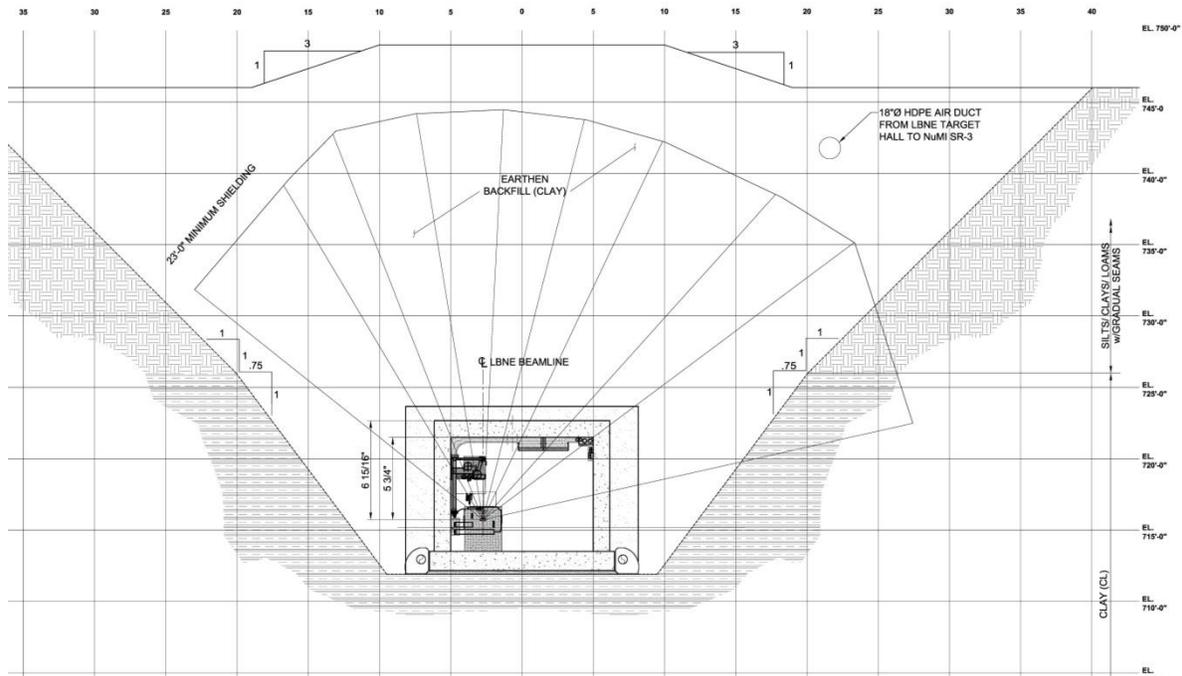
Primary Beam Enclosure section view. Shown as constructed in open cut trench.
